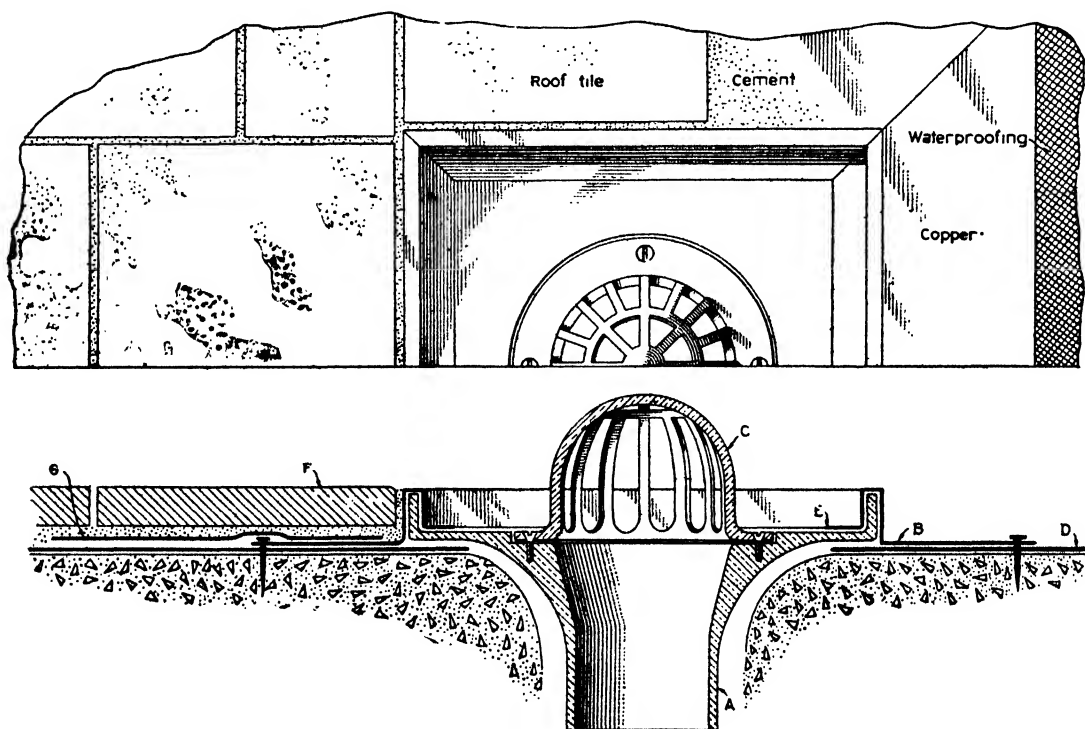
Construction and Method of Installing Roof Drainage Head
